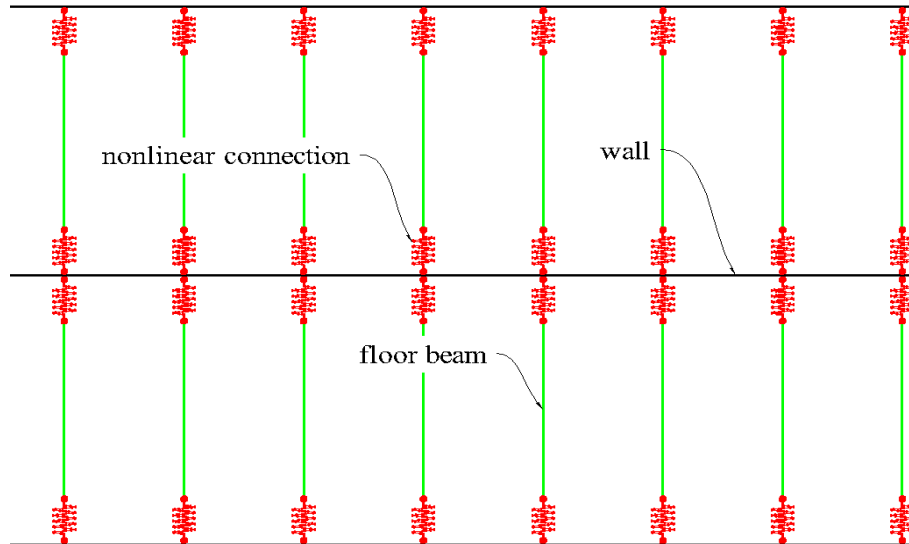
Nonlinear spring-like connection elements within a typical building floor plan.
